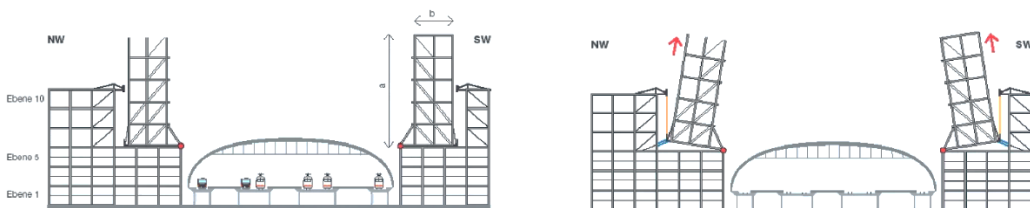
section in Bridge building in Berlin Central Station , Source: <https://en.wikiarquitectura.com/building/berlin-central-station/>
